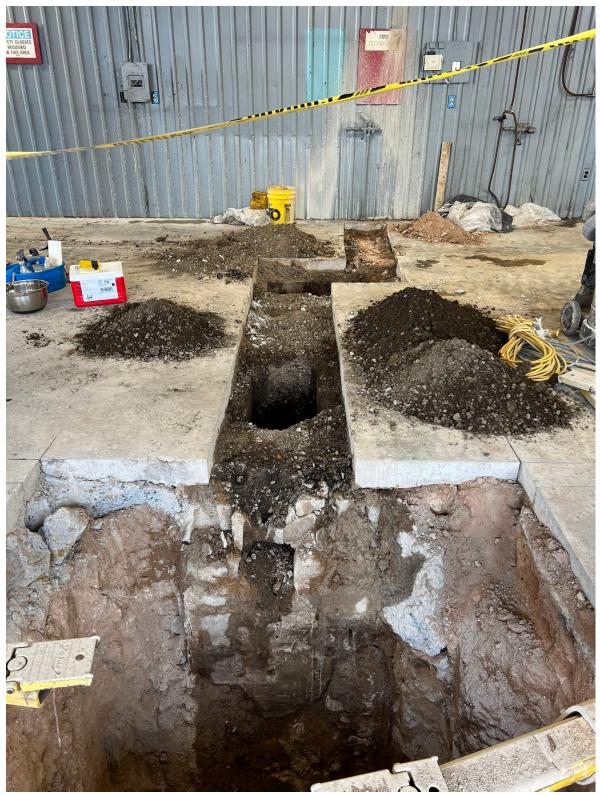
Photo of excavation of hydraulic lift S-2 and vault
